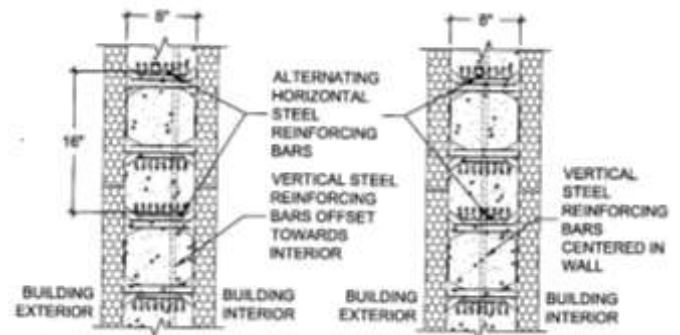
Typical reinforcing steel placement below (left) and above (right) grade
